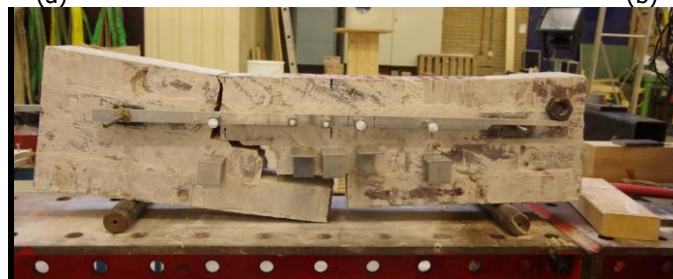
Crack pattern of perforated brick masonry specimens (TIL-H2) subjected to in-plane bending (IP).
